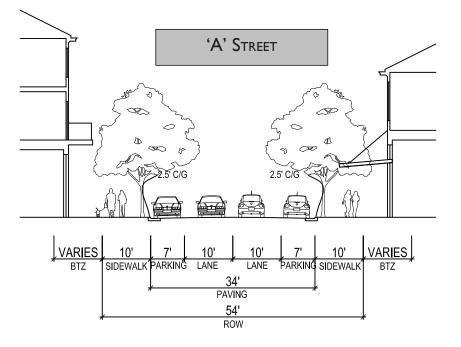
TYPICAL 'A' STREET CROSS SECTION
